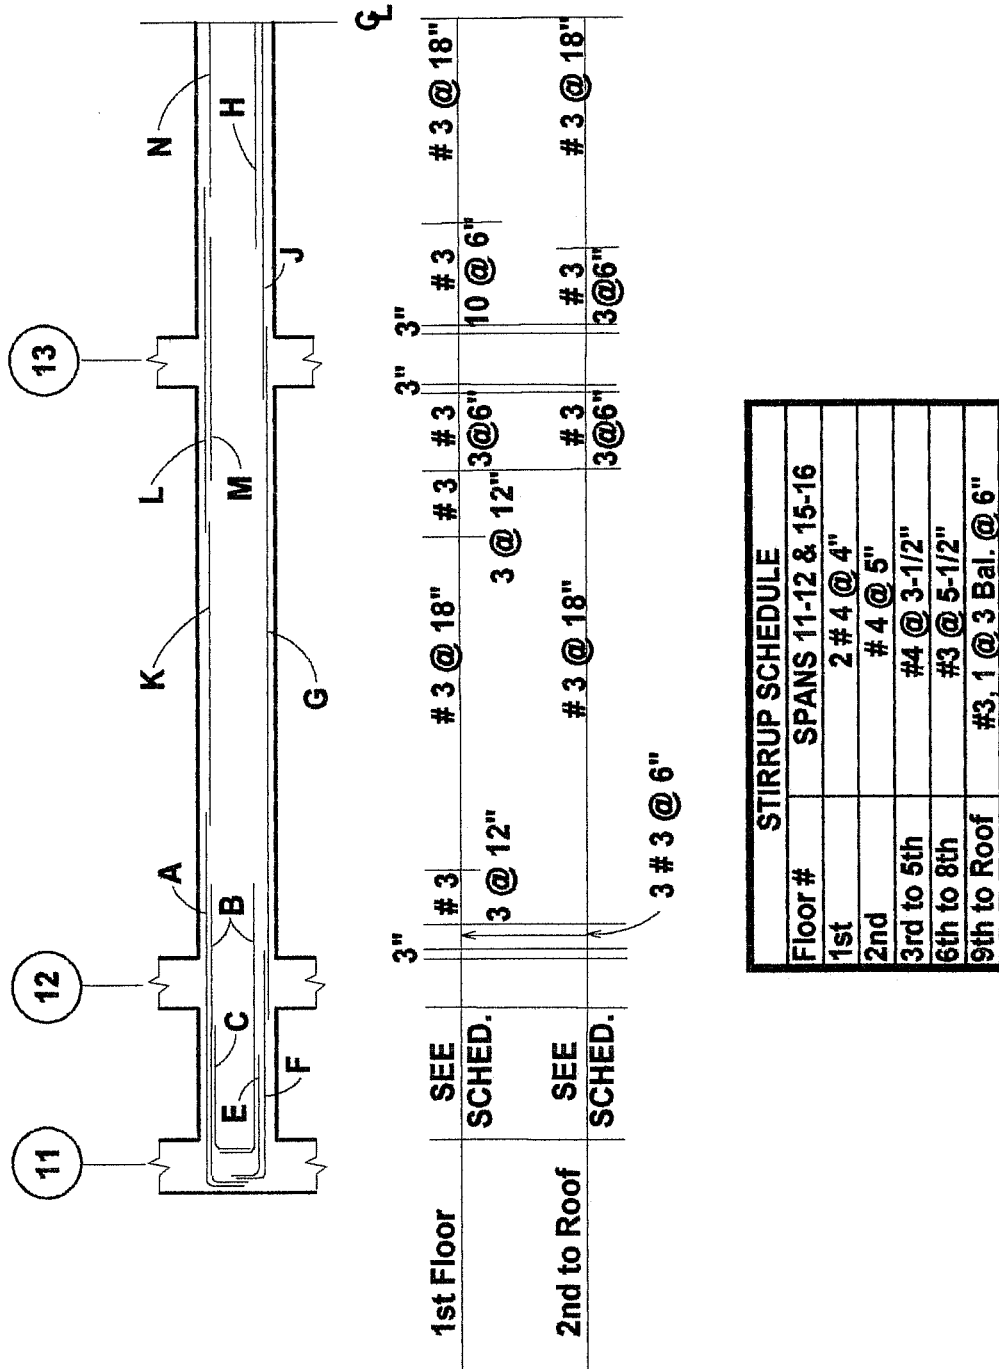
Spandrel beam reinforcing schedule for the 12-story building (Span 11-16).
